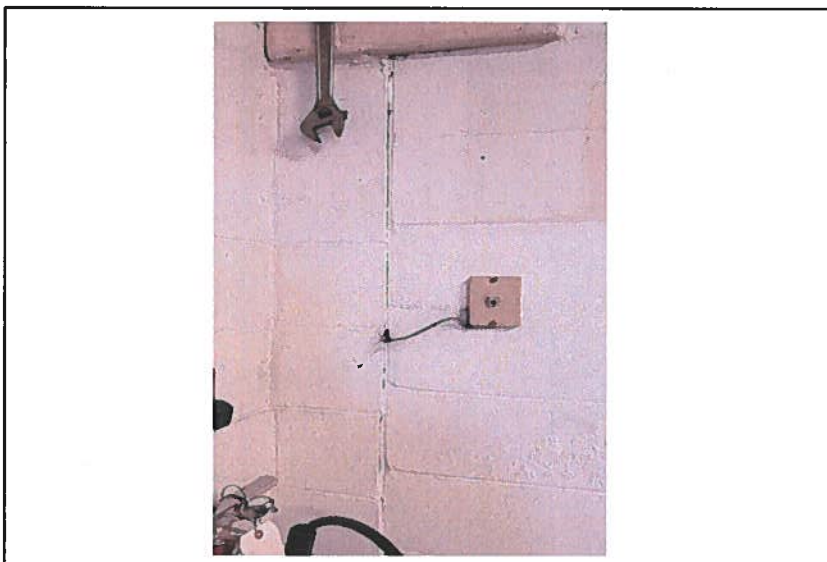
Mortar Joint Cracking in Compressor Room
